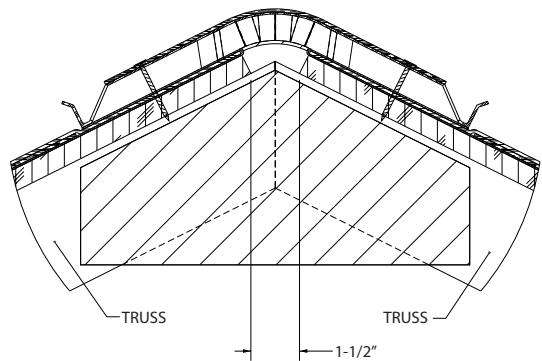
RIDGE BOARD TYPE CONSTRUCTION
